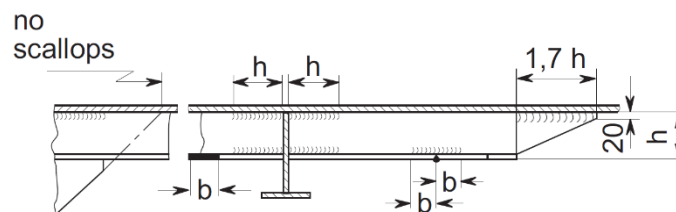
Welds at the ends of girders and stiffeners
